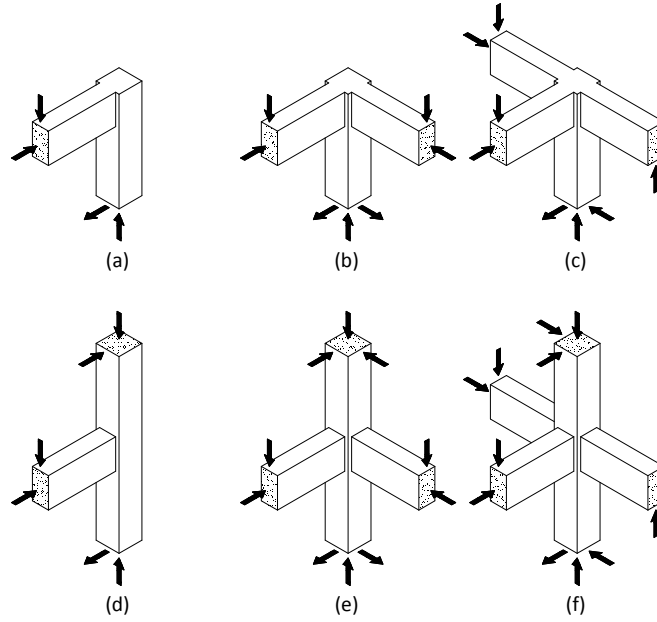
Exterior beam-to-column joints (Paulay & Priestley, 1992).
